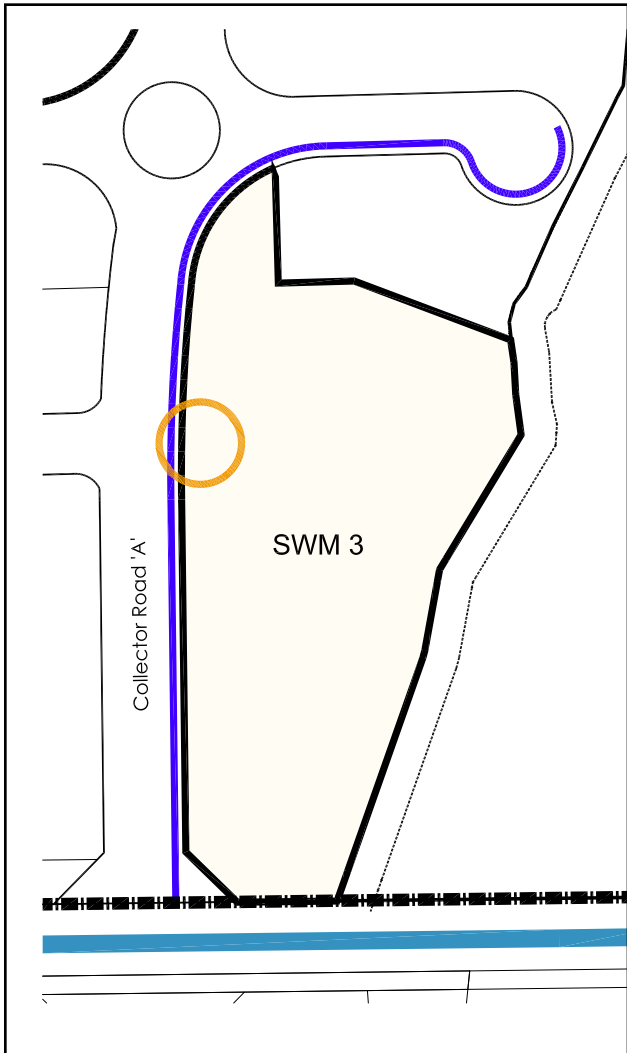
SWM Pond #3 Facility Fit Concept (1.26ha./3.13ac.)
